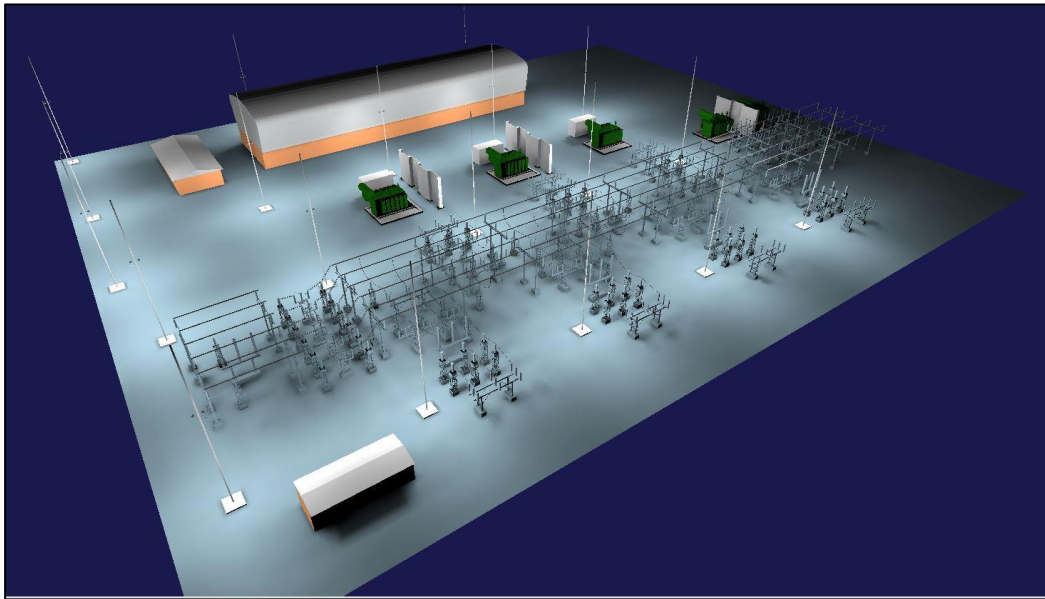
Ystervark Substation - Outdoor Lighting 3D Illustration
